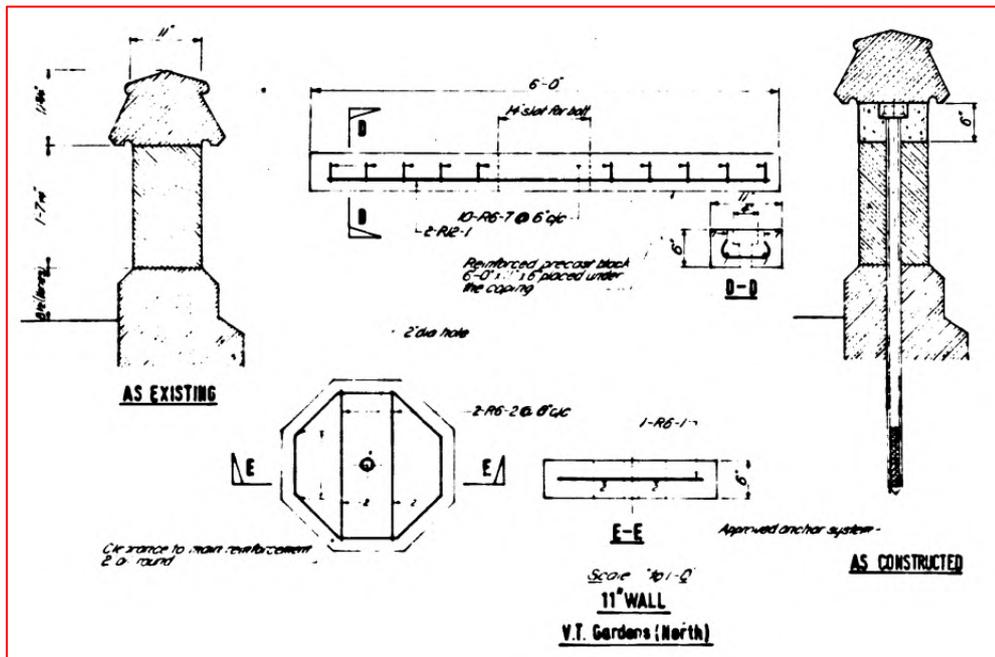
Extract from 1981 Interim Wall Raising Drawing
